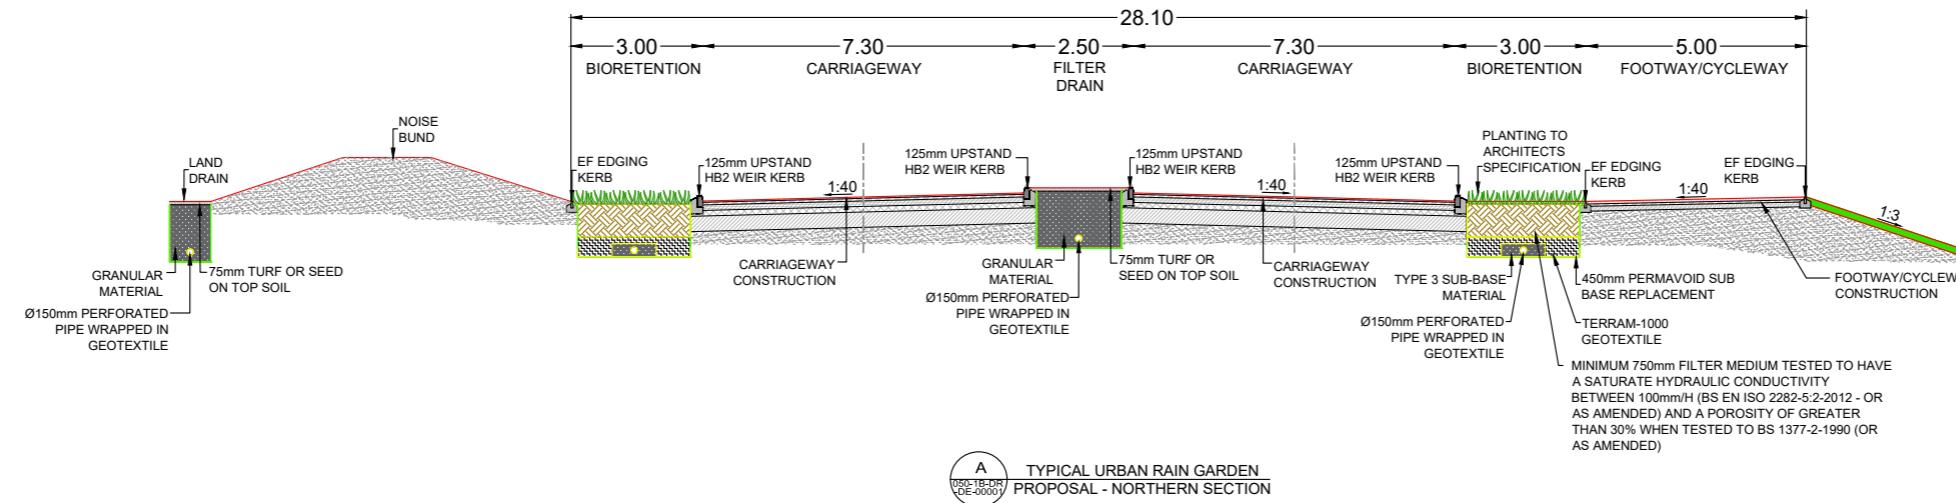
Typical Urban Rain Garden Proposals Sections
